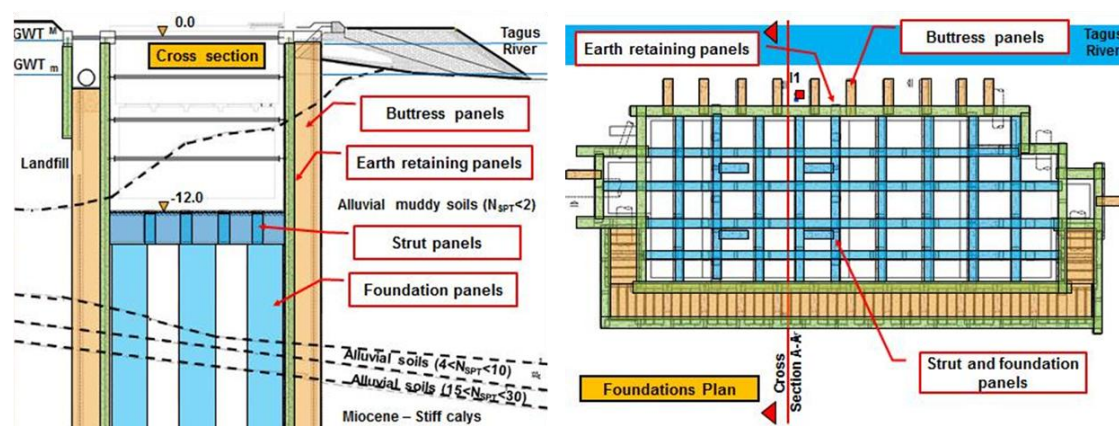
Cross section (on the left) and plan of the adopted solution (on the right), after [Pinto et al. \(2012\)](#)
